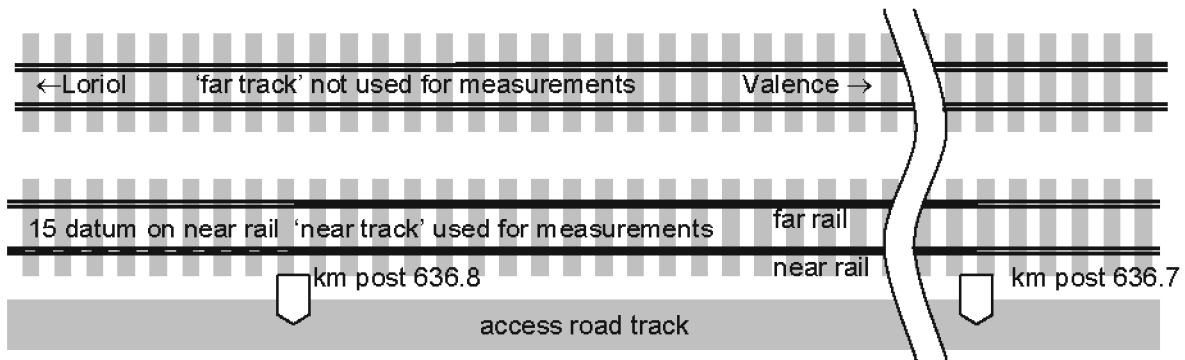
Layout of the test section of track at Loriol (— reference section, - - - datum)
